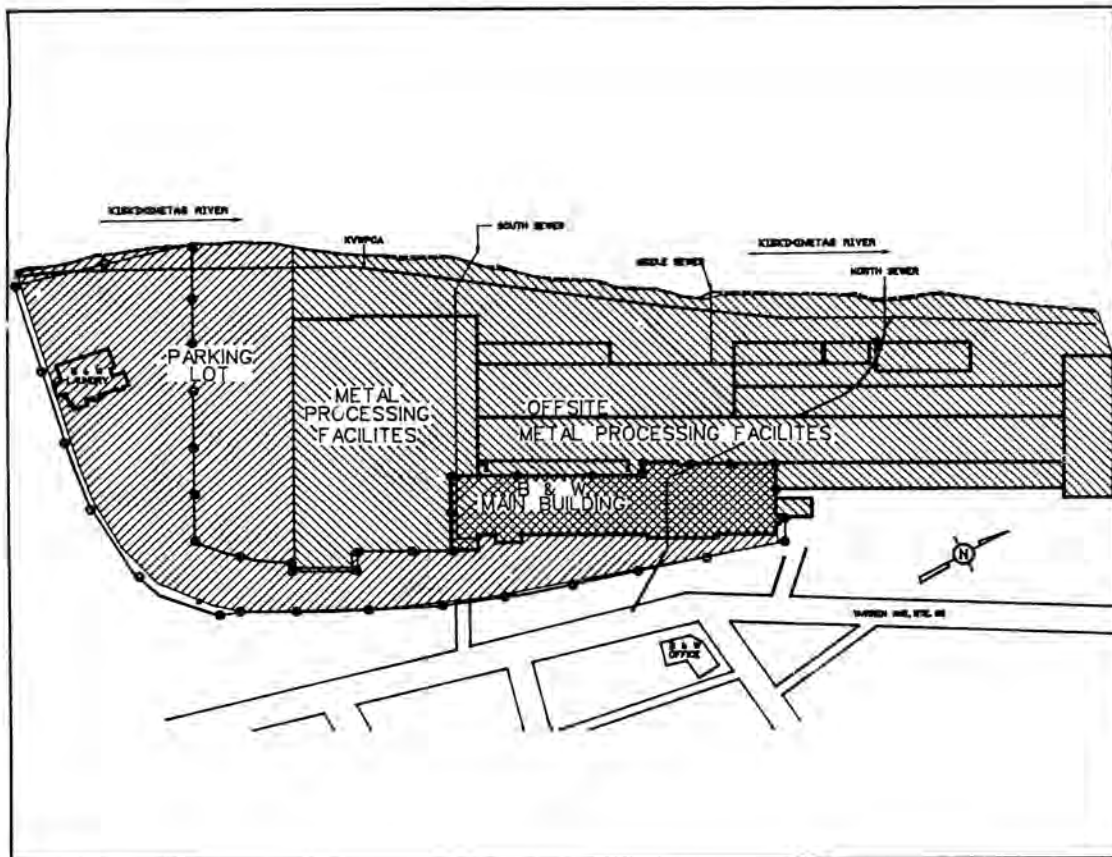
Apollo Nuclear Fuel Plant: site arrangement.
